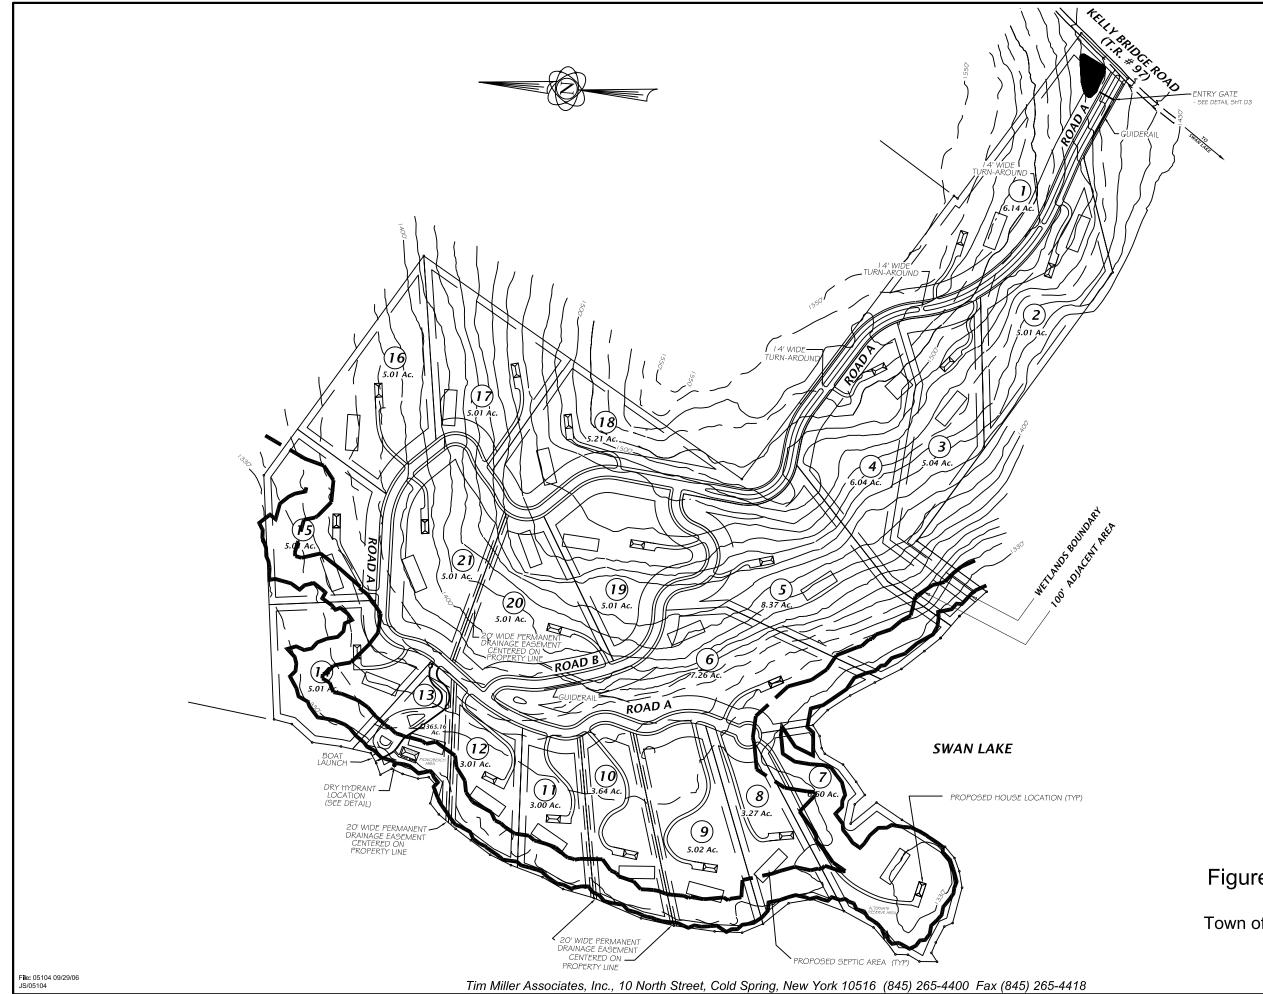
Kelly Bridge Key Plan Swan Lake Estates Town of Liberty, Sullivan County, New York Source: Wasson Engineering, Rev. 1/24/05 Scale: 1" = 350'
